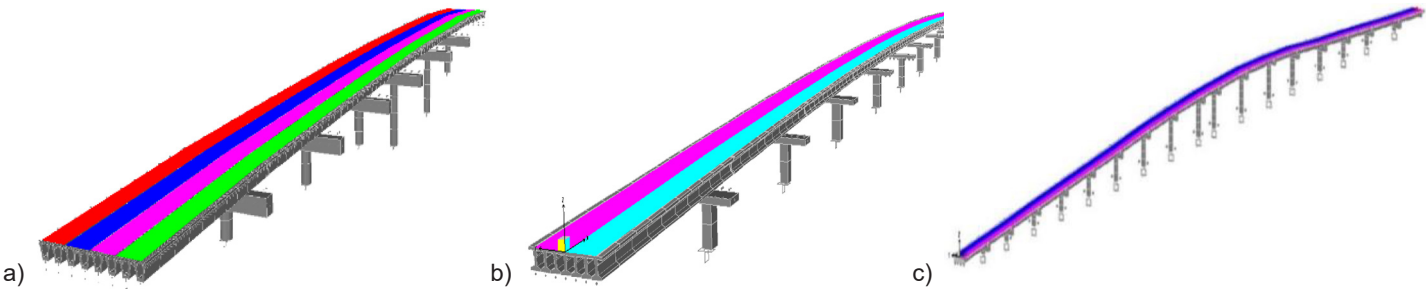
FEM modelled bridge cases: a) Bridge-I, b) Bridge-II, c) Bridge-III
